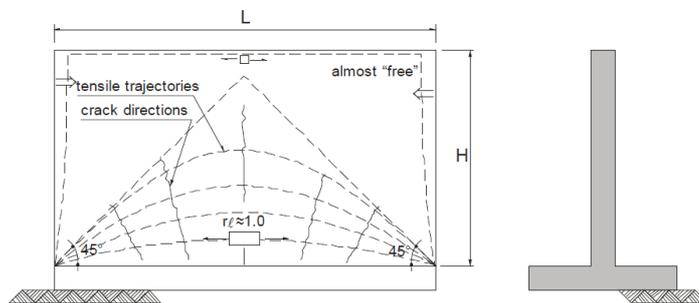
Deformations of a wall cast on an already hardened floor slab; degree of restraint, direction of tensile trajectories and cracks indicated<sup>8</sup>
